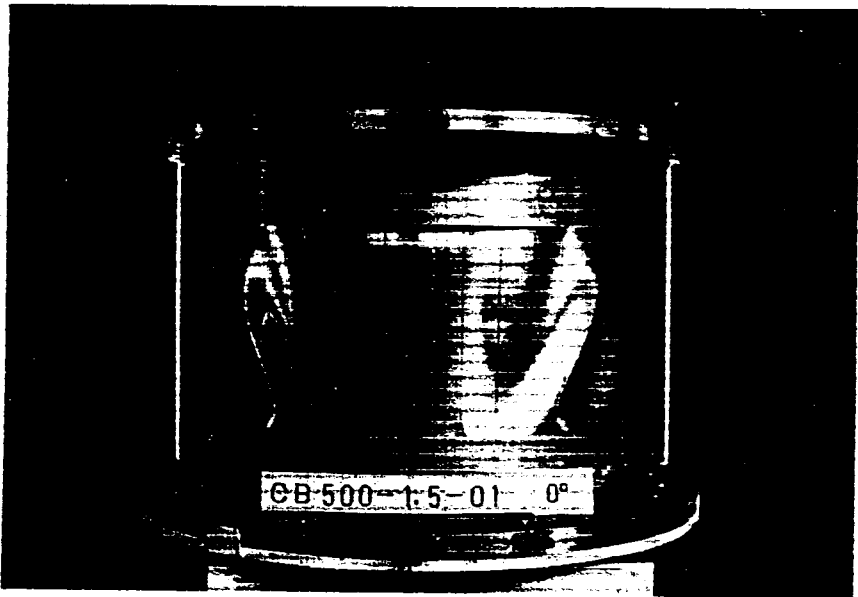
(d) Cylindrical test piece after shear-bending buckling test
